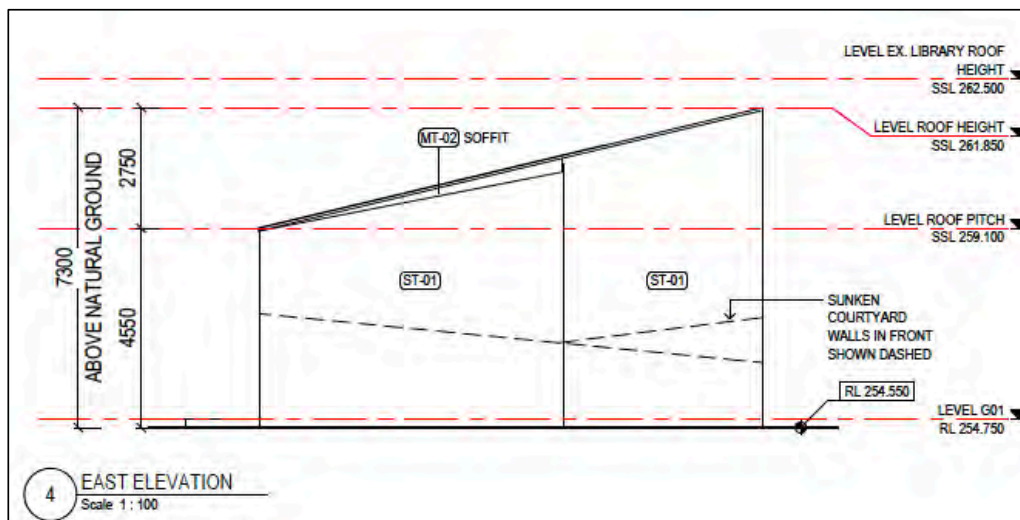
East elevation showing wall and roof height as well as height of basement courtyard walls.
